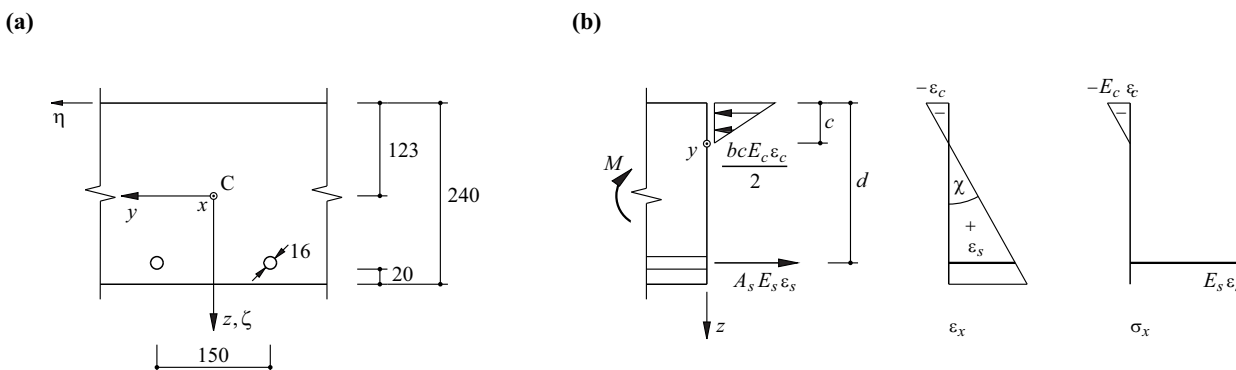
Reinforced concrete slab: (a) uncracked state (I), (b) cracked state (II)
